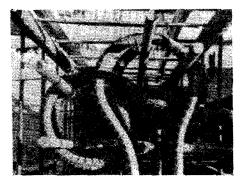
Example of special measures taken to reinforce intersection of spandrels at corner, Muir Medical Center, Los Angeles, California.
